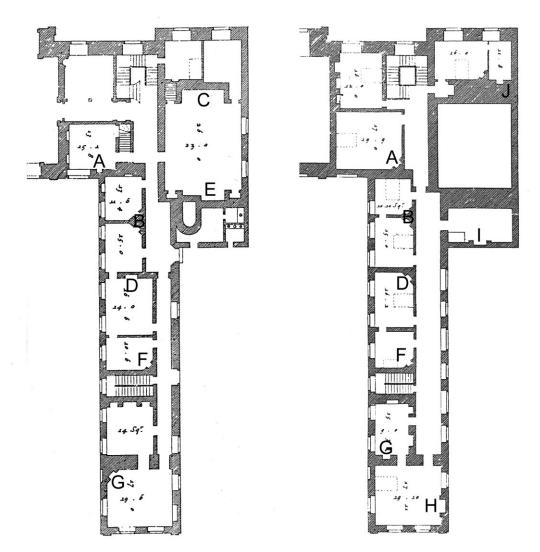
The Campbell plans of 1717, ground floor (left) and first-floor (right) with the lettering of the chimney stacks used in figures 82 to 85. Stack H also served the extension on the south side of the wing end added after the plan was made.
